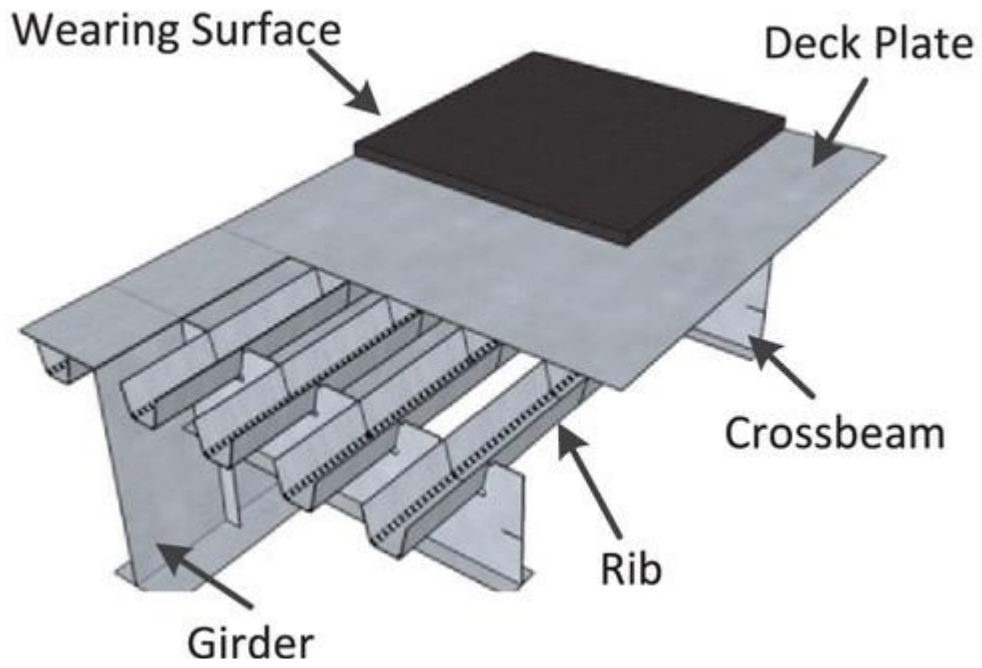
shows Rib-to-Deck Joint in Orthotropic Steel Bridge Deck, Photo credit ASCE[65].
